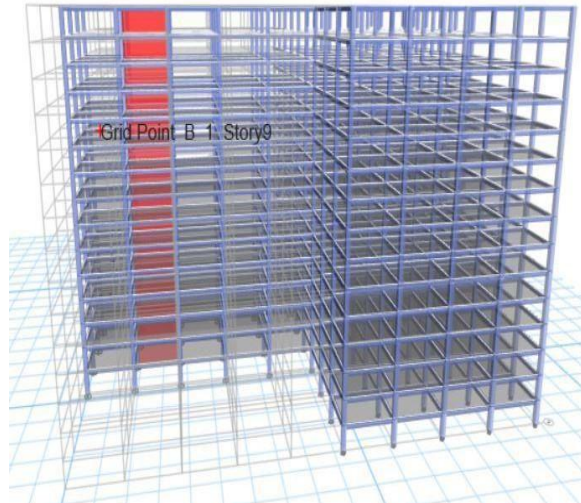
3D Plan View Showing Shear Wall (Red) Positions — Storey 9
